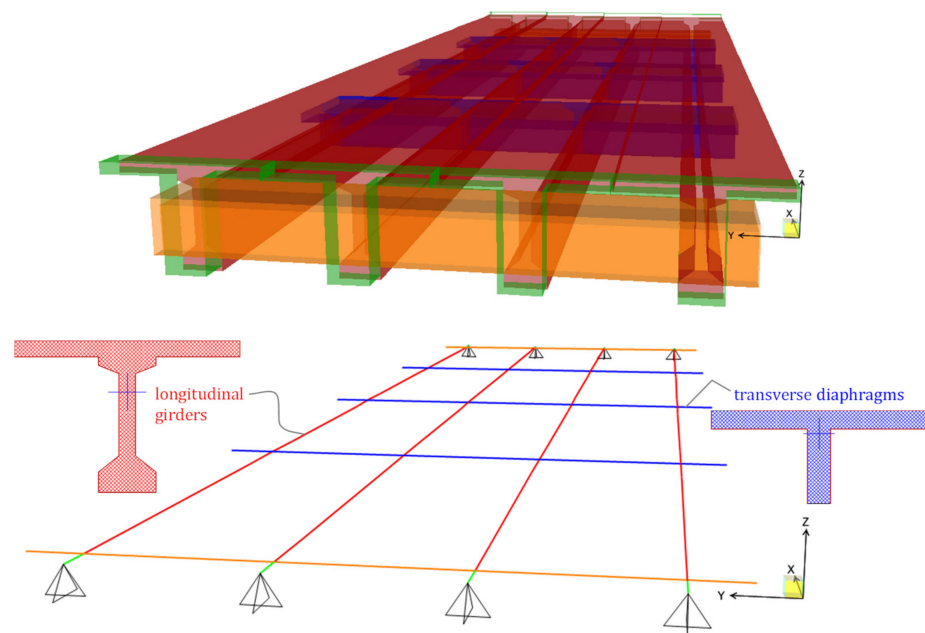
FE model of the bridge deck with 1D beam elements: extruded and standard view.
